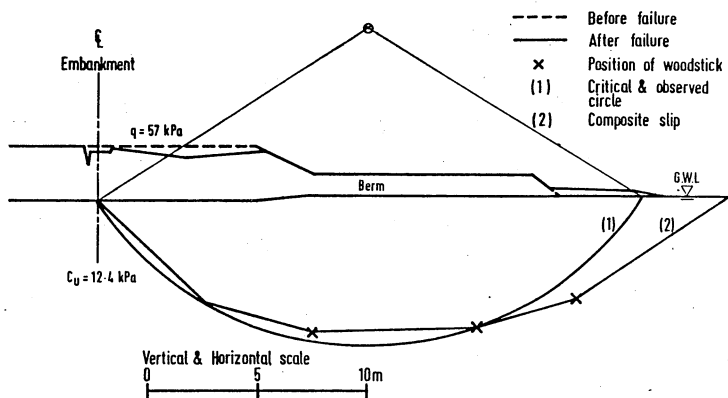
Case Study on Test Embankment on Bangkok Clay (Test section B)
